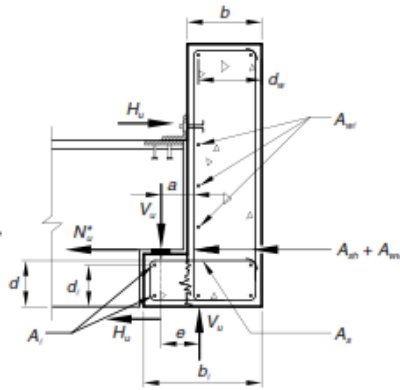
Typical ledger beam supporting stems of precast double-tee members.
